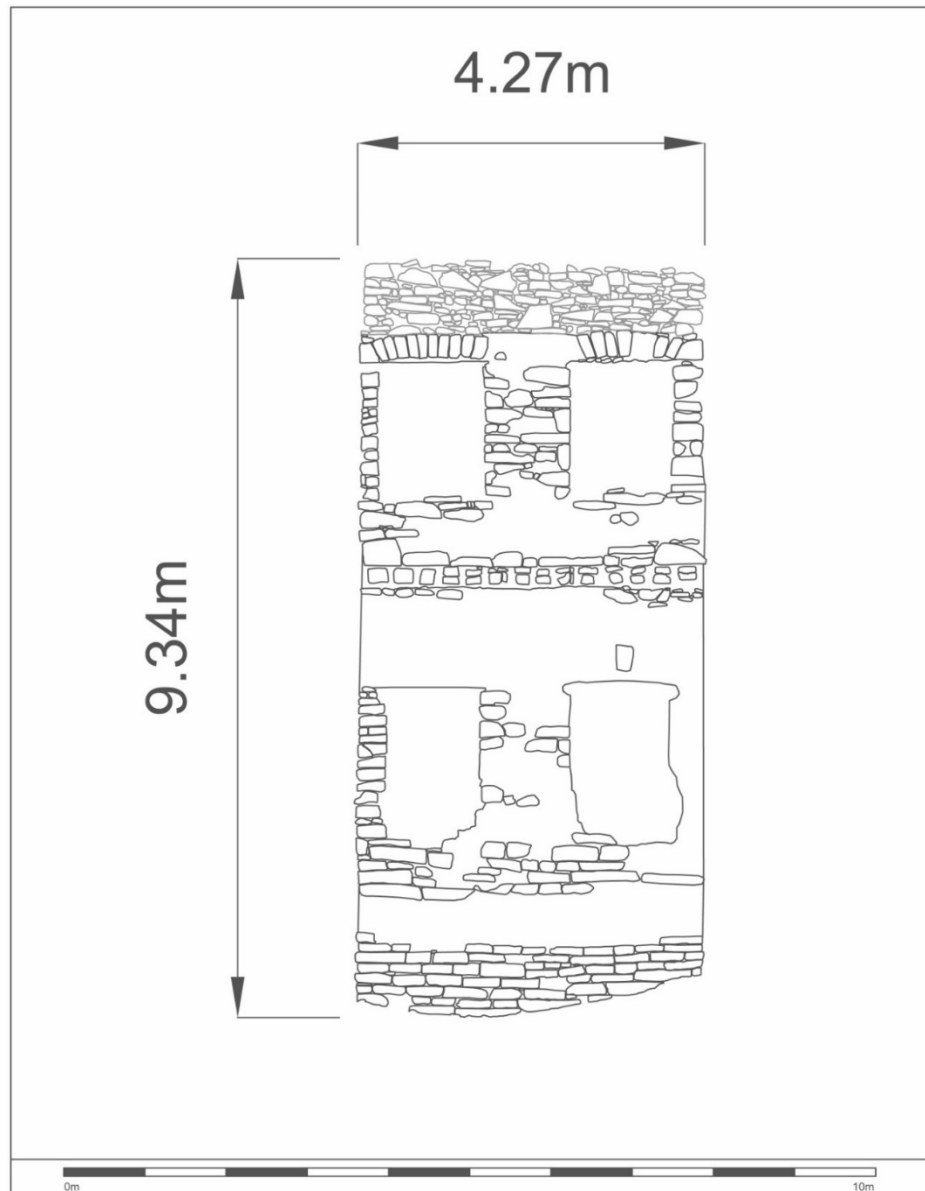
Internal elevation of the south wall the signal tower at Glash Signal Station.
